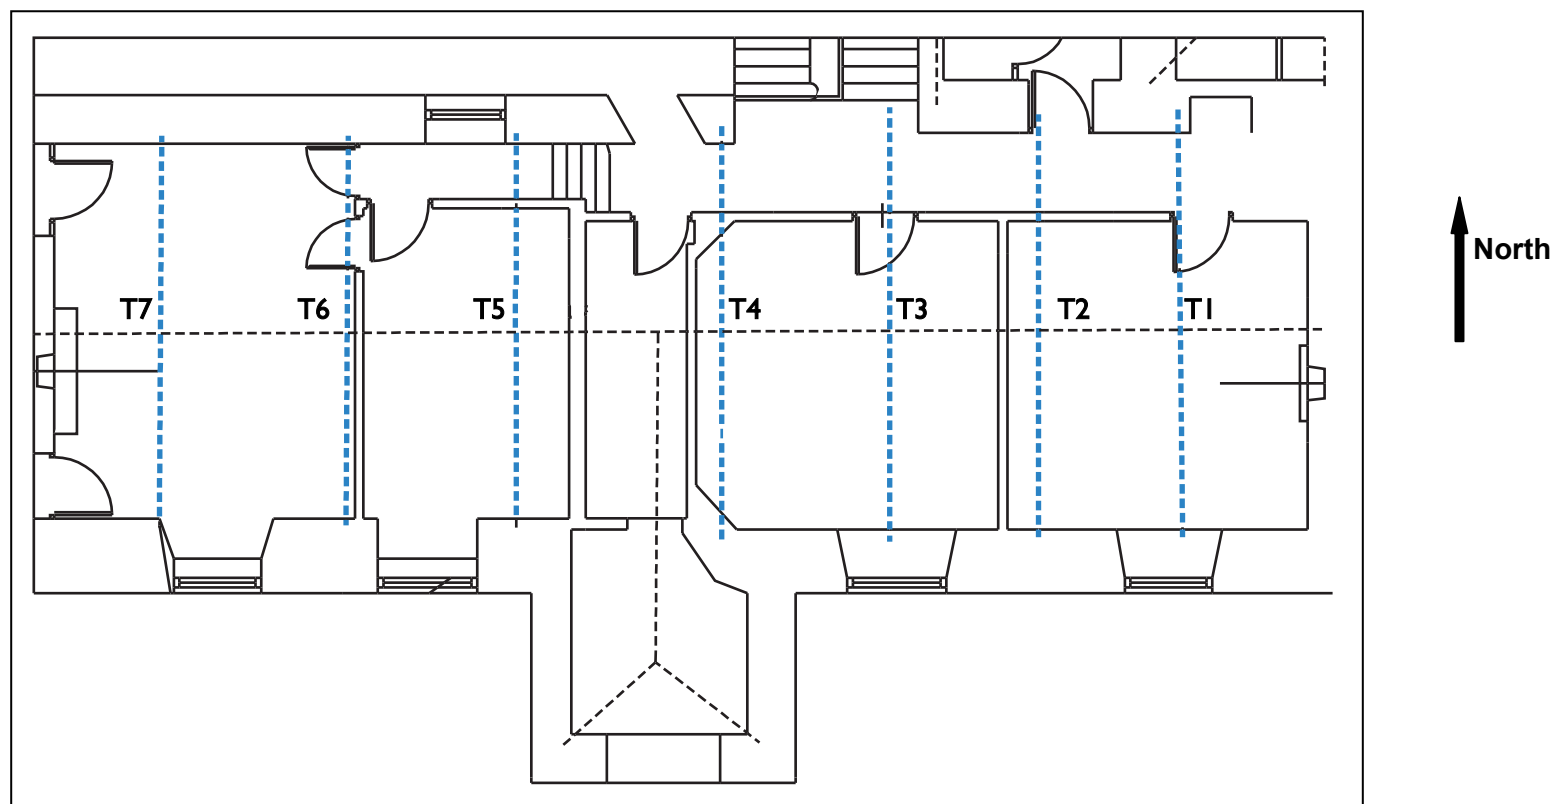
Plan of the central range, trusses shown in blue (Trusses 1 and 7 are replacements) (Duchy of Cornwall)
